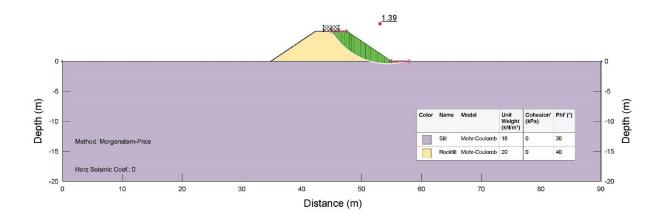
Slope stability of rockfill embankment over silt, 5 m fill – Min FOS = 1.4
